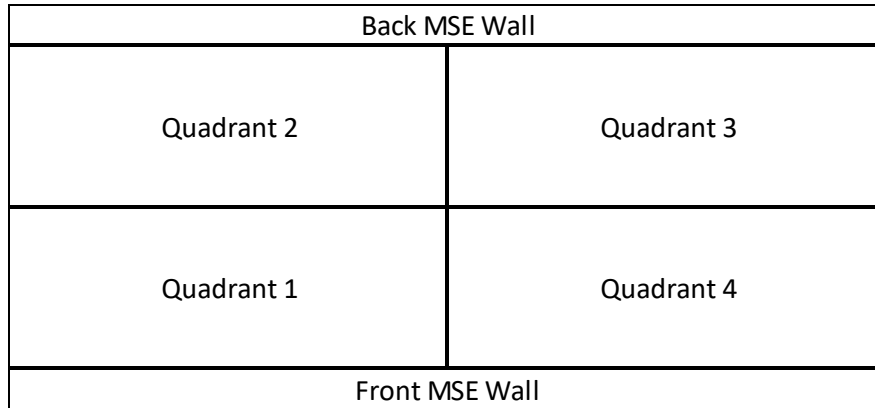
MSE wall area plan view of quadrants for nuclear density testing.
